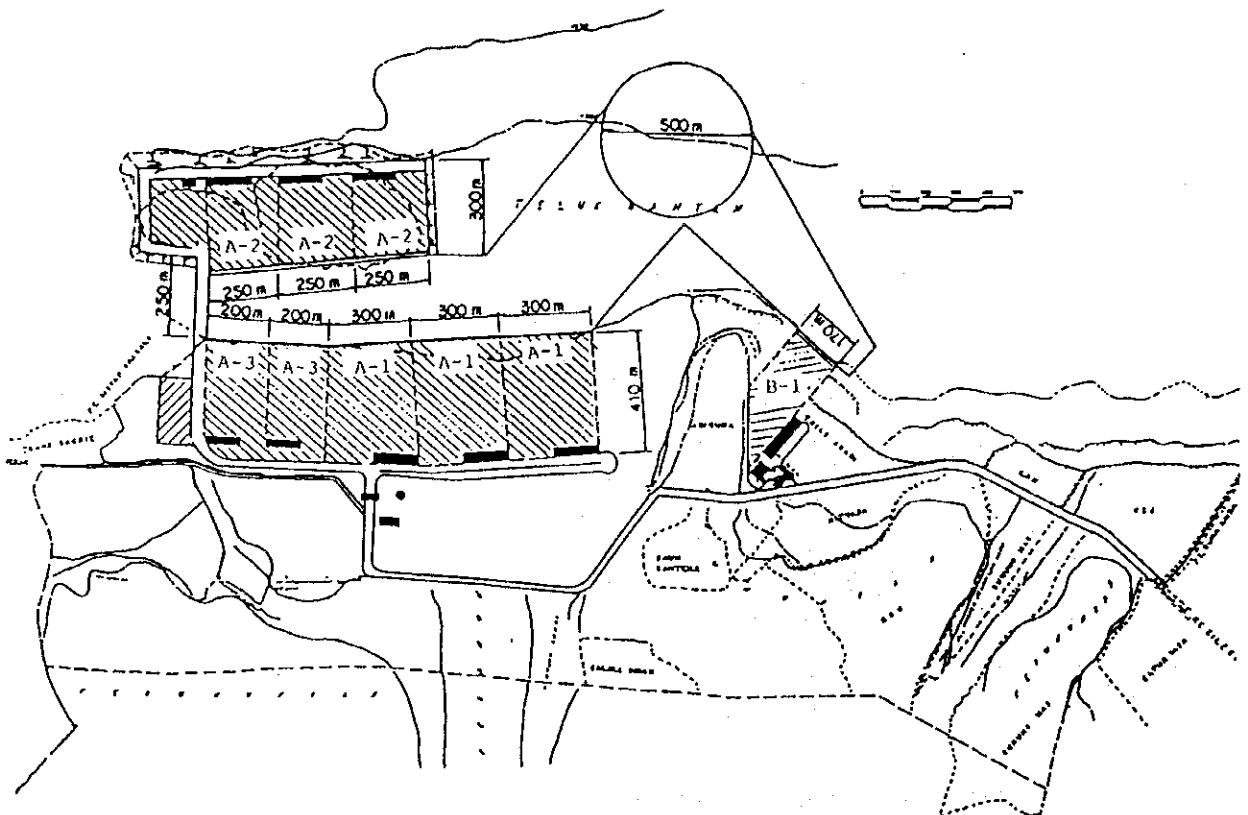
Layout of Bojonegara (Alternative IV)
